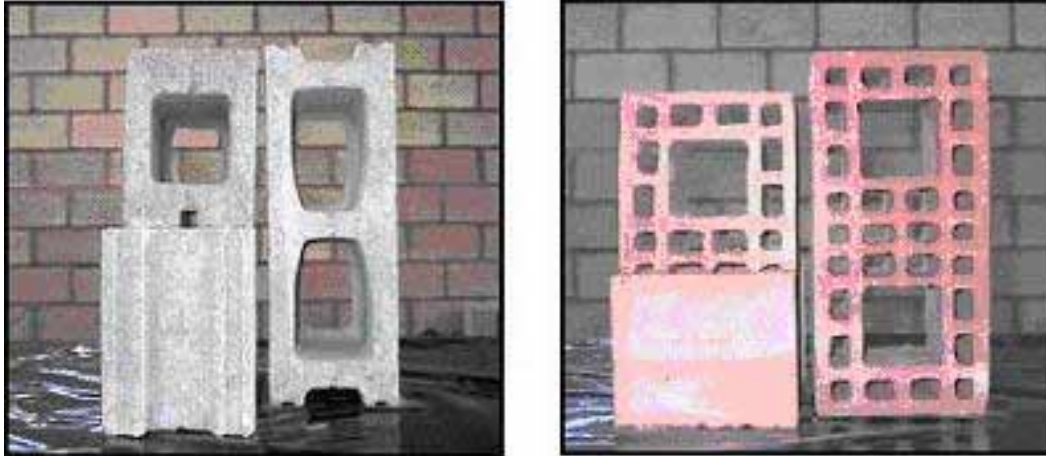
Concrete masonry unit (left) and hollow clay brick masonry units (right)
